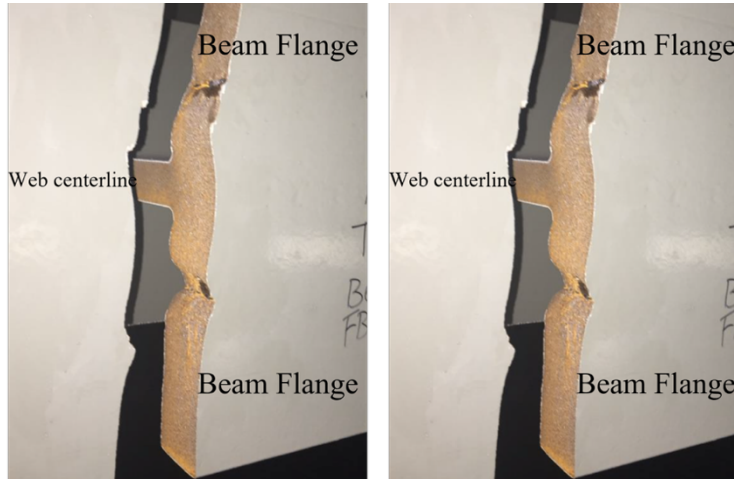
Example of Fracture Initiated from the Boundary of Holes Filled with Weld Metal. I-276 Delaware River Turnpike Bridge Truss (2016) [3] [1]
